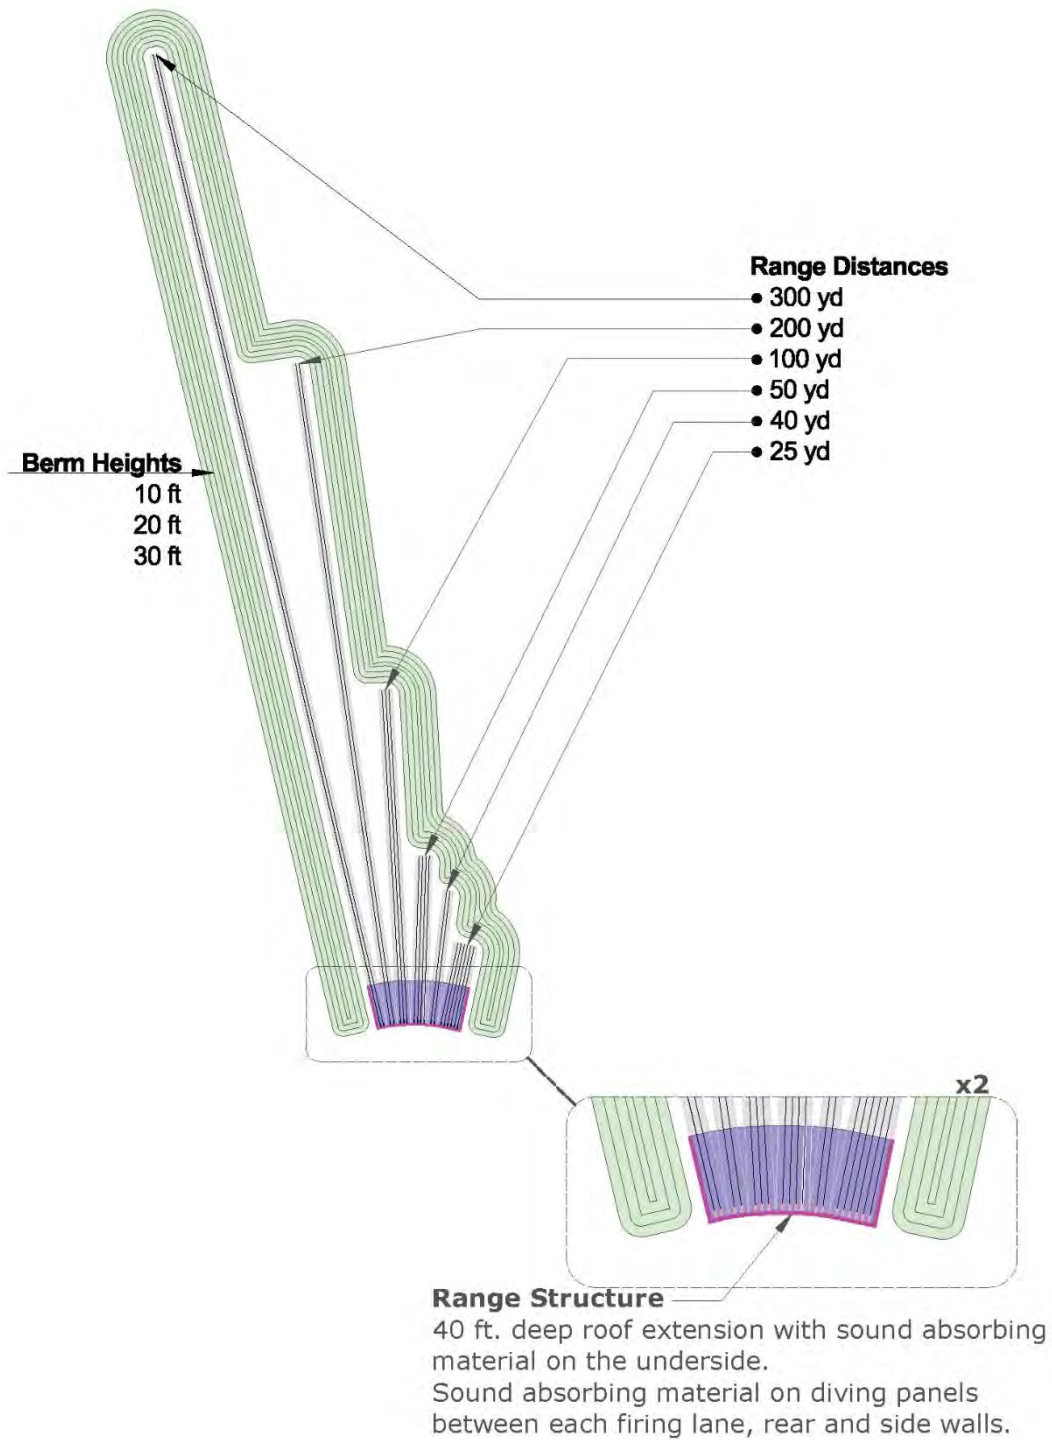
Concept plan for the range structure with the 40 ft. extension of the roof with the rear and side walls added and the interior sound absorbent lining described in Appendix N.
